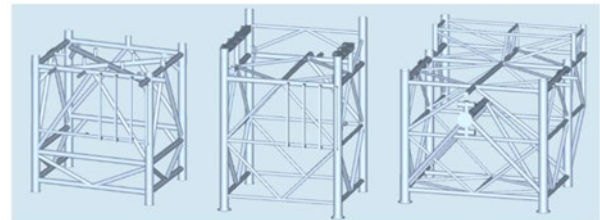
Jackets geometries (Left to right – Mooring Jacket J2, Mooring Jacket J3 and Berthing Jacket J7)
